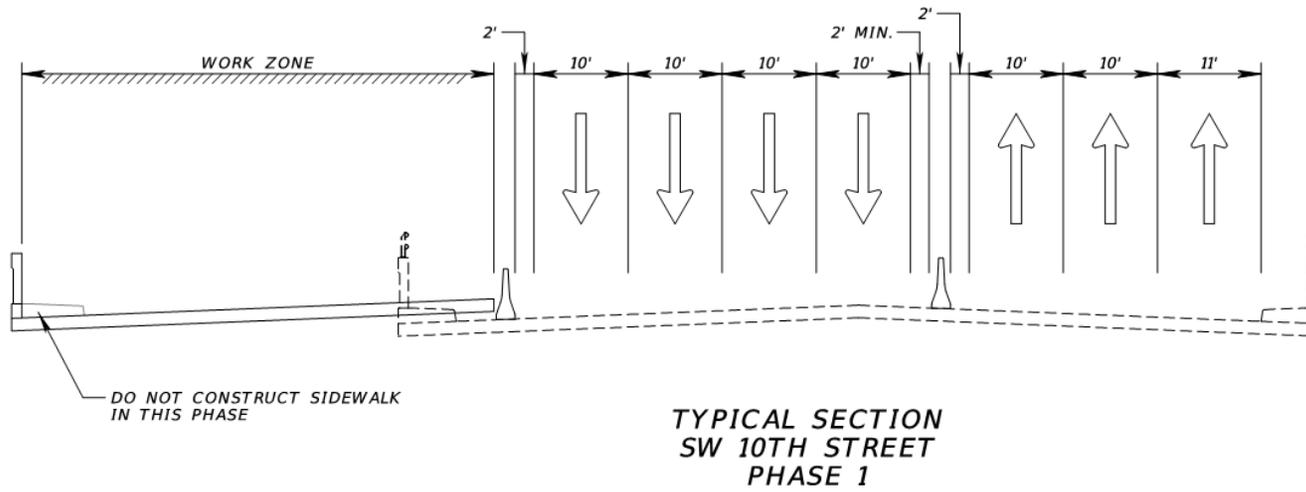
TCP Typical Section SW 10 St – PHASE 1
